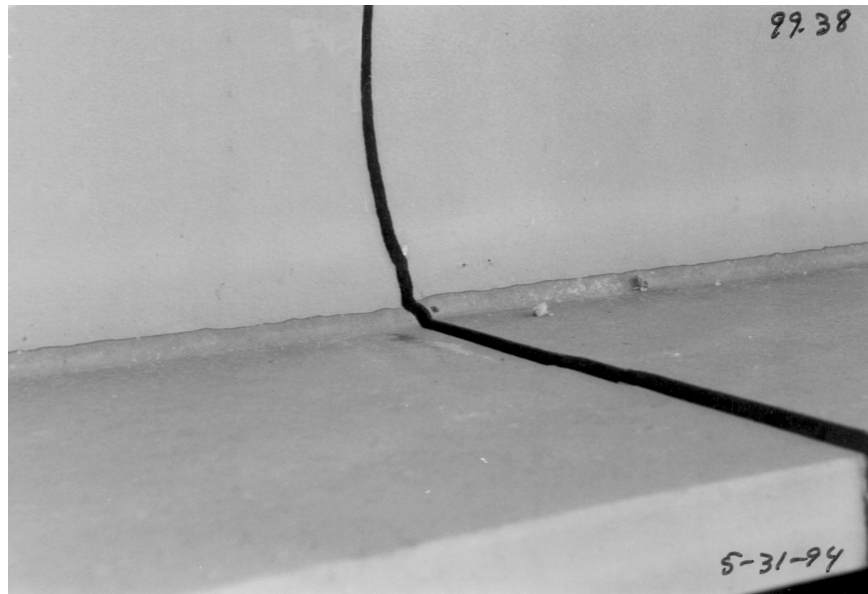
View of fracture from the top surface of the bottom flange
